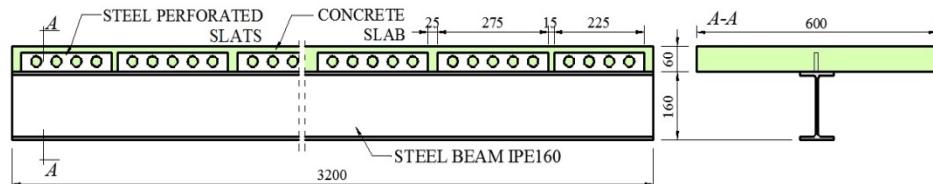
Composite beam from B2 group: longitudinal view and cross-section
